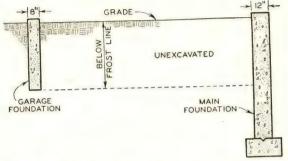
Section at C-C of Garage Foundation Shown in Fig. 3
